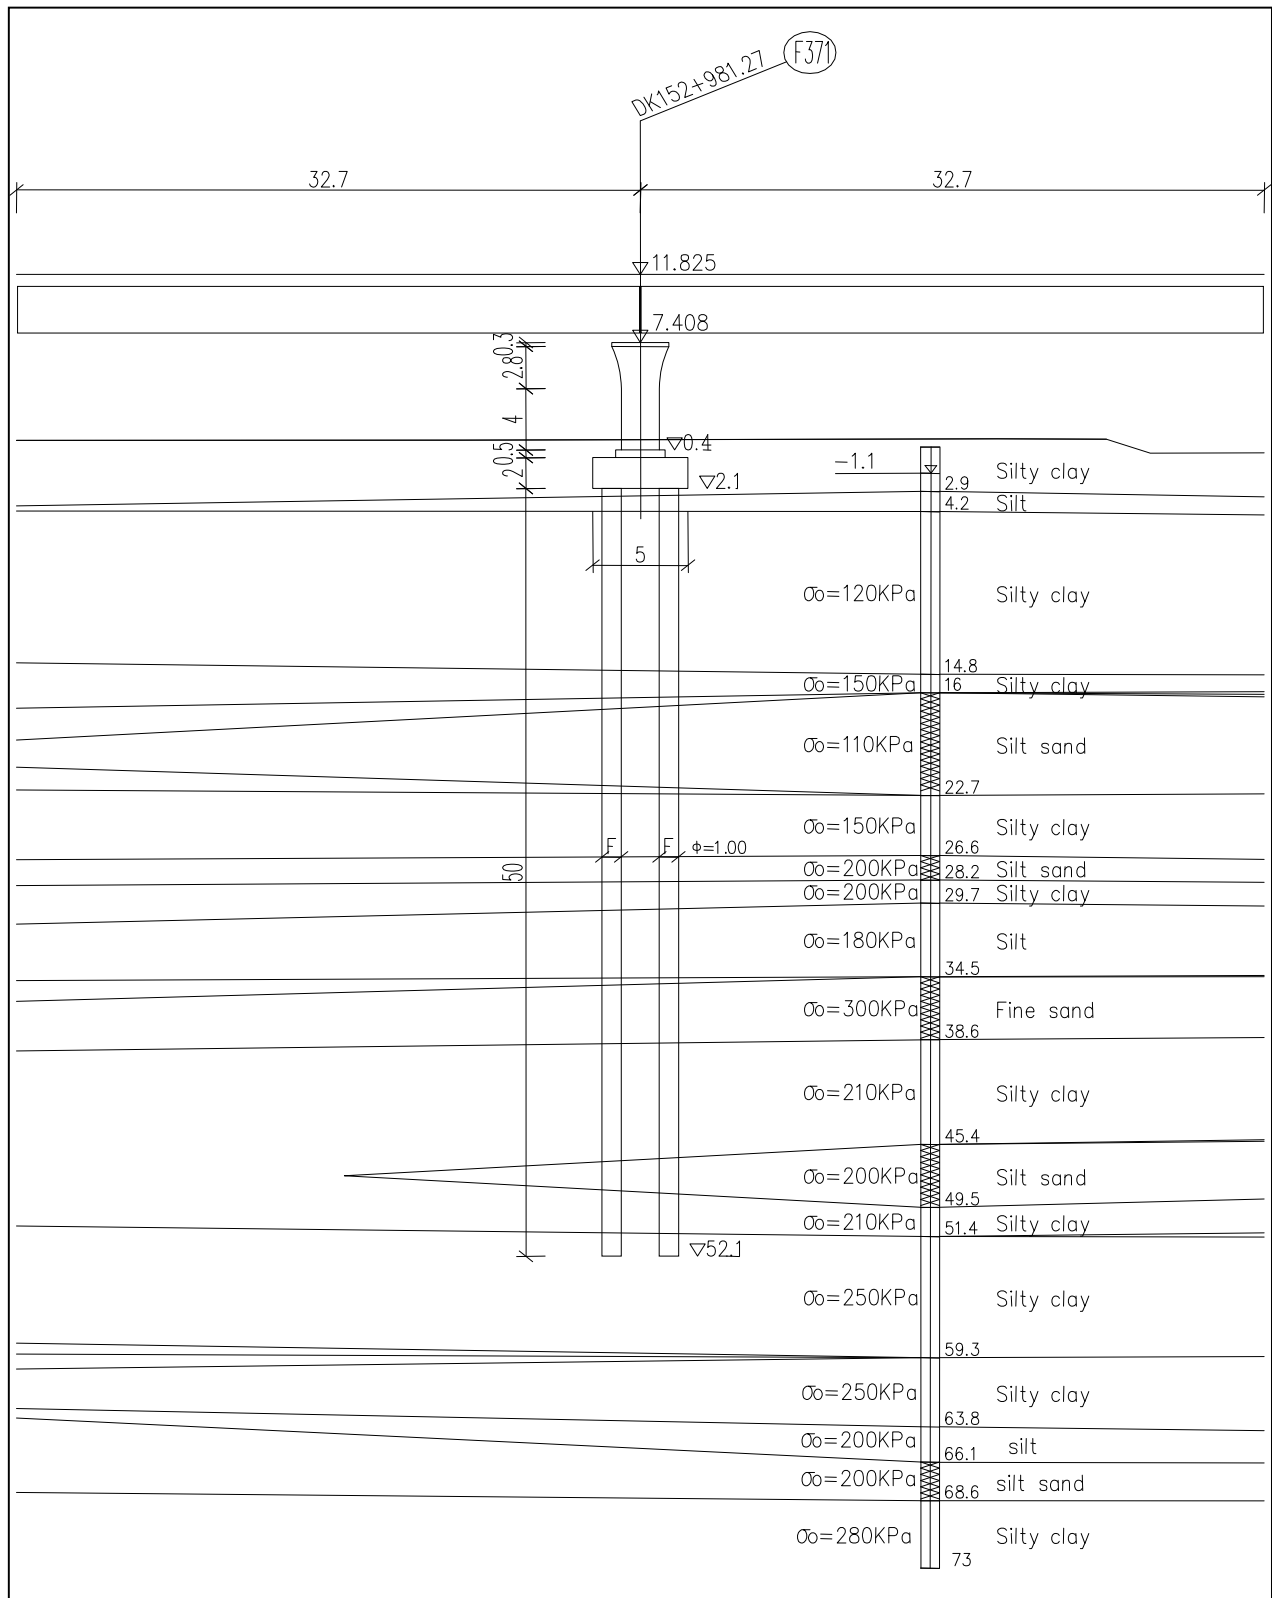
Sketch of the soil layers of Beijing-Shanghai high-speed railway bridge at location DK152, F371 (All dimensions are in meter).
